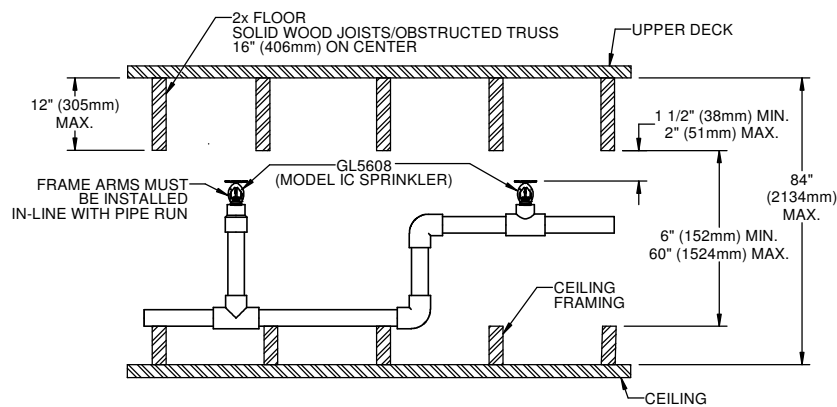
STEEL PIPE OBSTRUCTED WOOD TRUSS OR SOLID WOOD JOIST CONSTRUCTION
